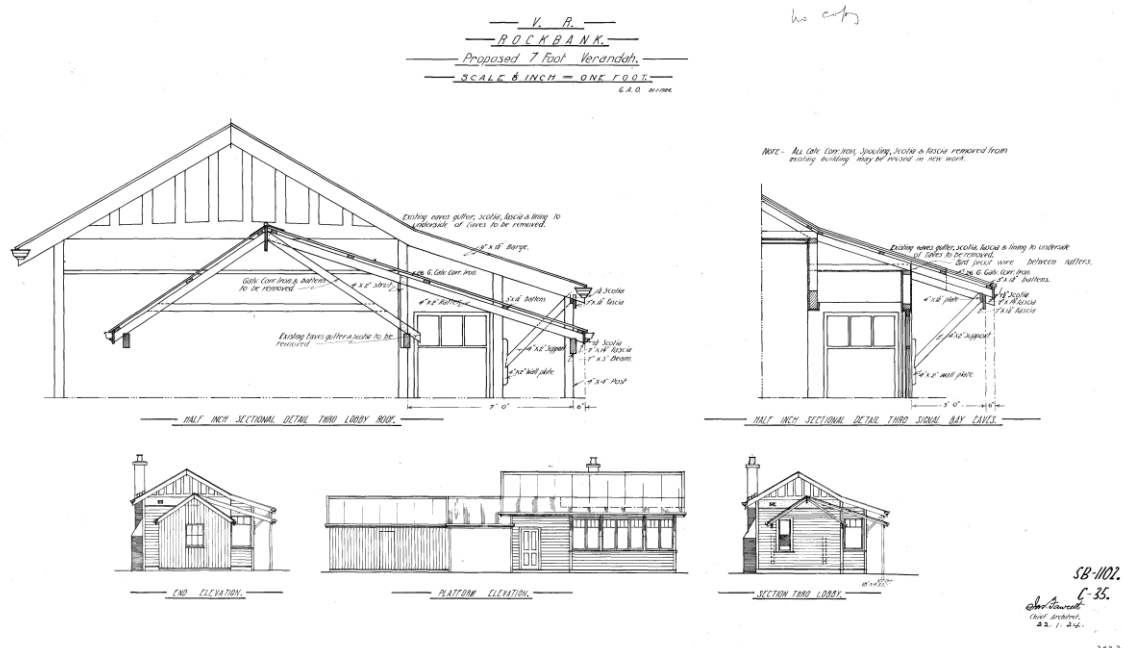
Plan of proposed verandah additions to Rockbank Station VR drawing 1924.
